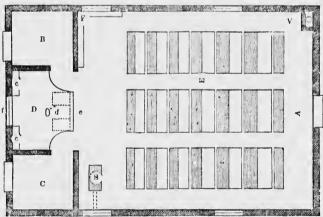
Ground Plan adapted, with modification, to Figs. 79, 81, 84 and 86.
